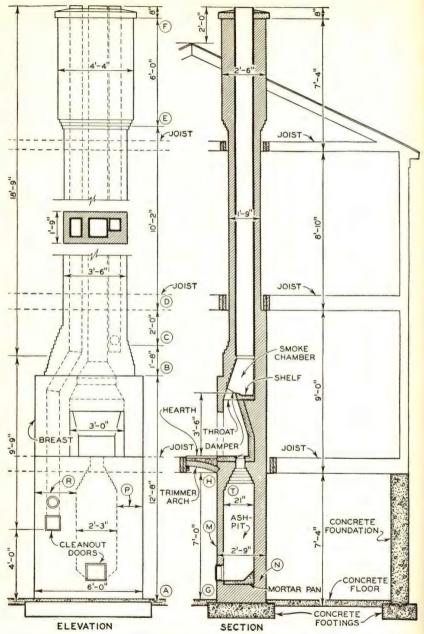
Elevation and Section Views of the Fireplace and Chimney Shown in Fig. 3
